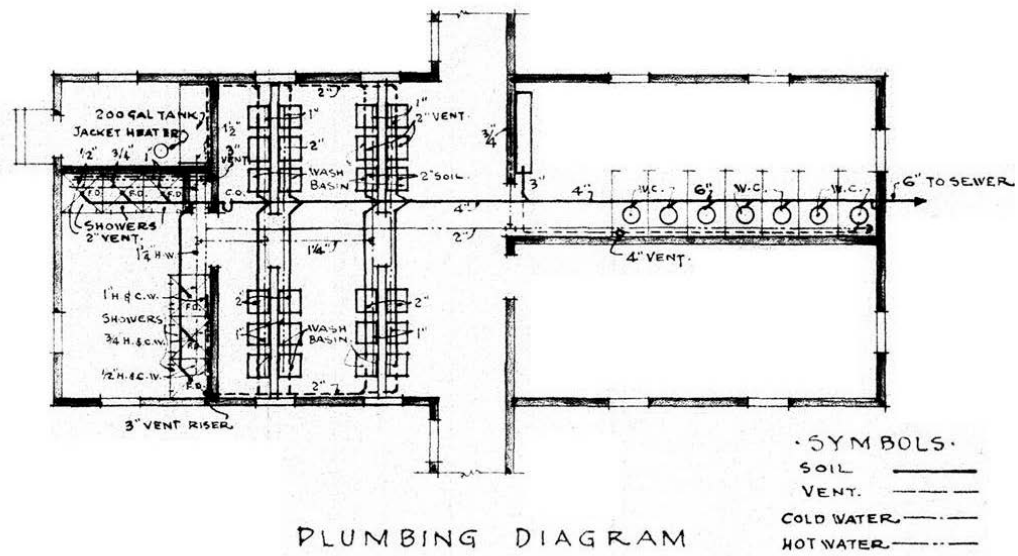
RCAF generic architectural plan, bathroom and plumbing detail. Note the six shower stalls and twenty-four wash basins. (Courtesy of the Commonwealth Air Training Plan Museum)
